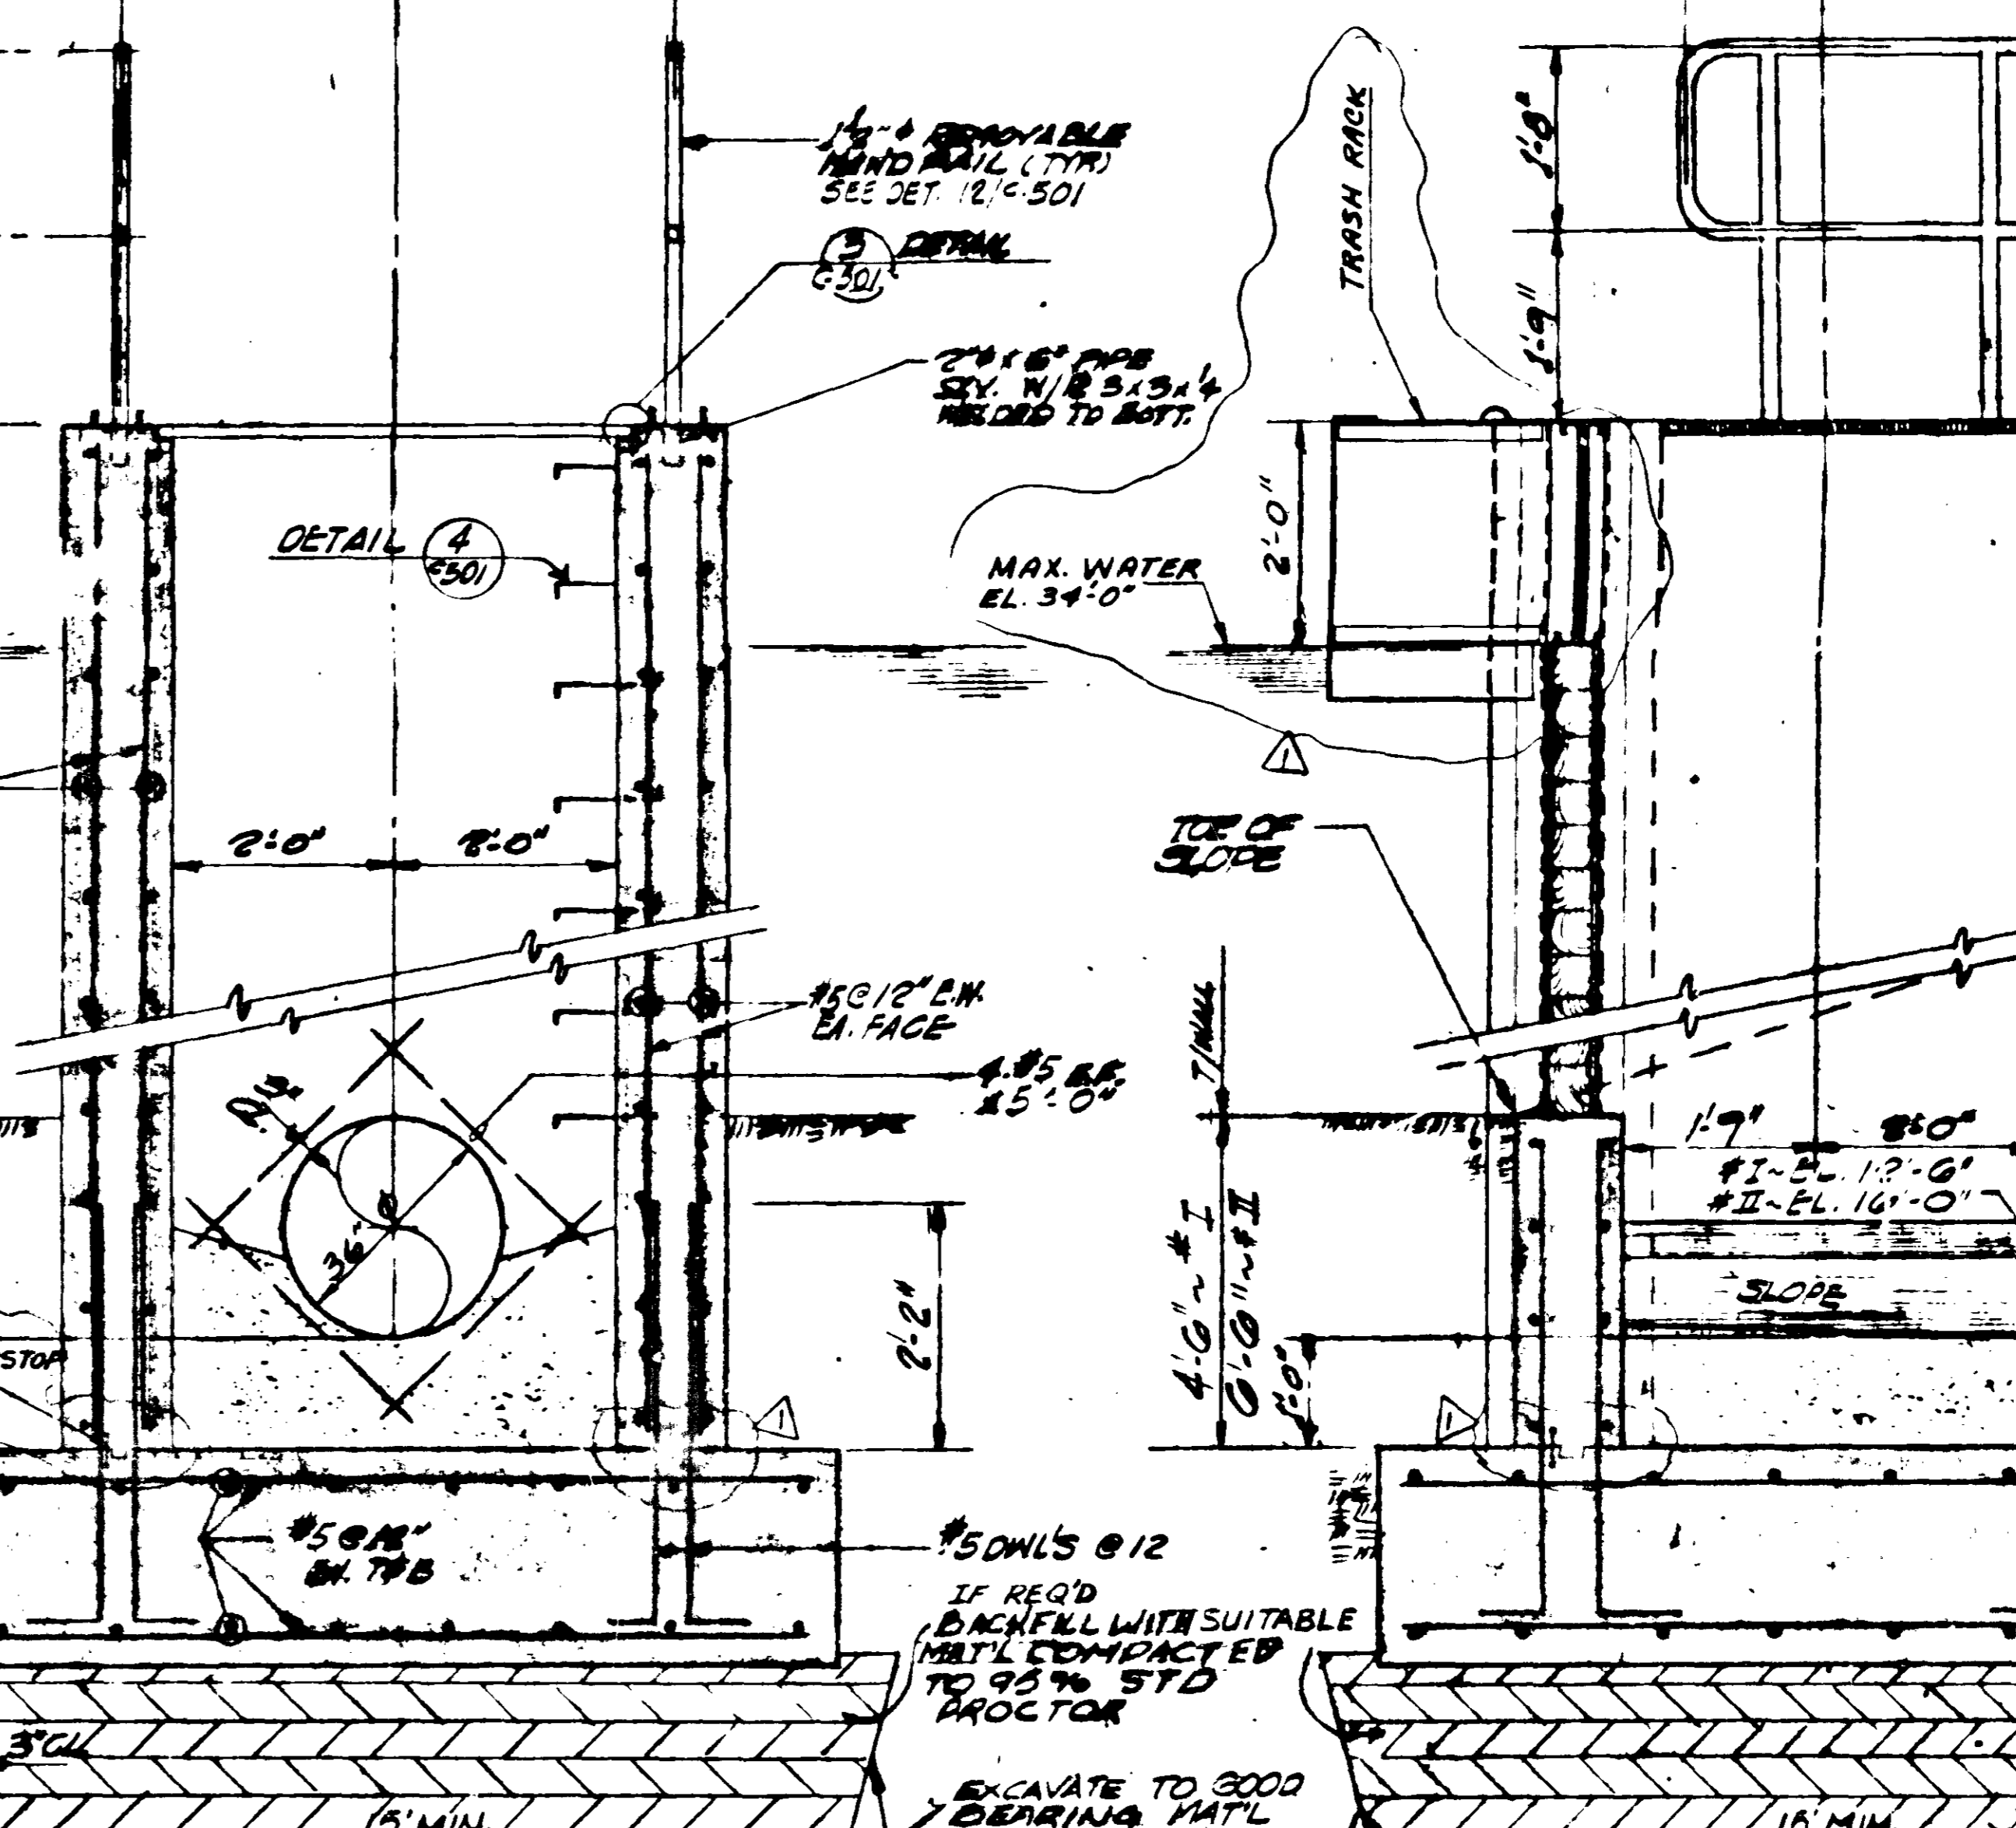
DETAIL OF CONCRETE ANTI-SEEPAGE COLLAR
